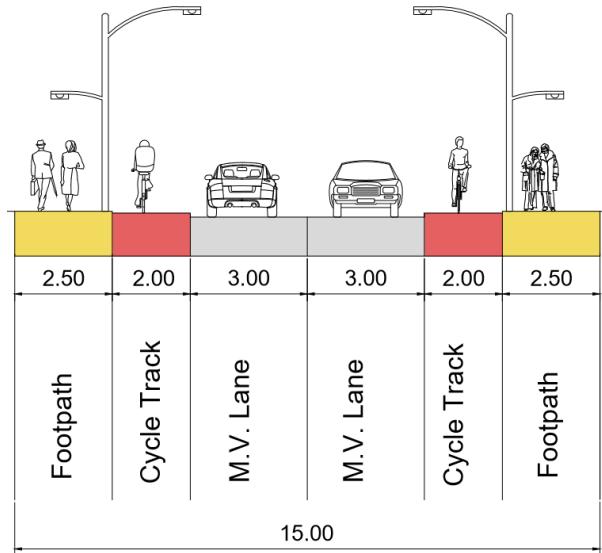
Collector road with raised adjacent cycle tracks, without parking
